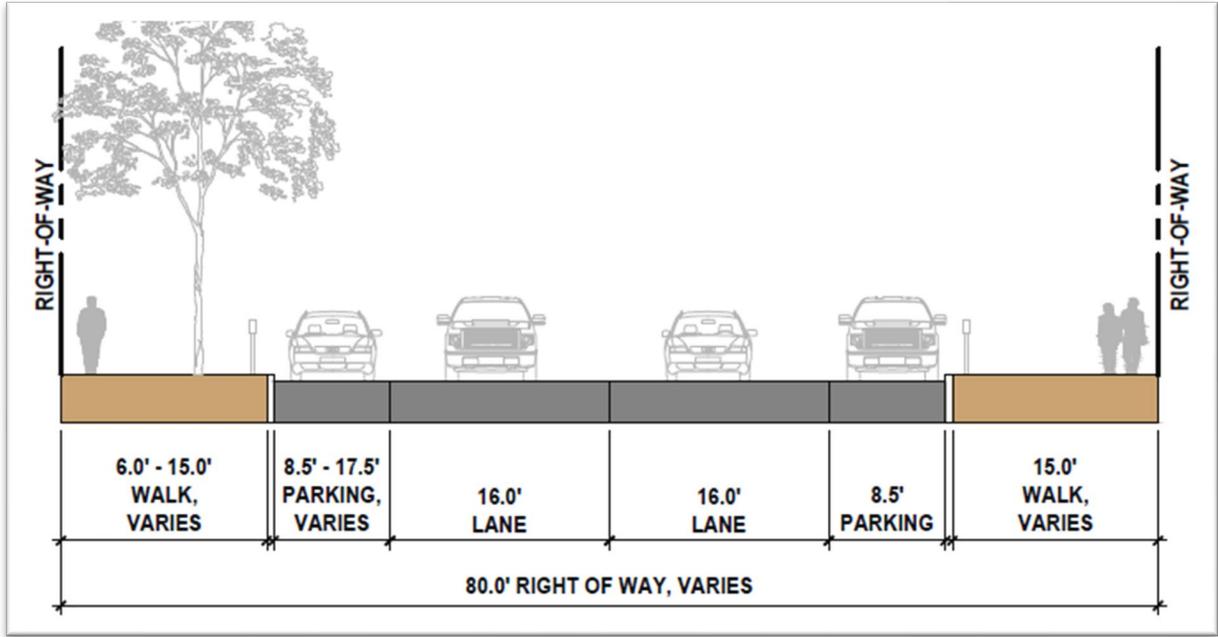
4th St - Existing Cross-Sections Between Rood Ave & White Ave
